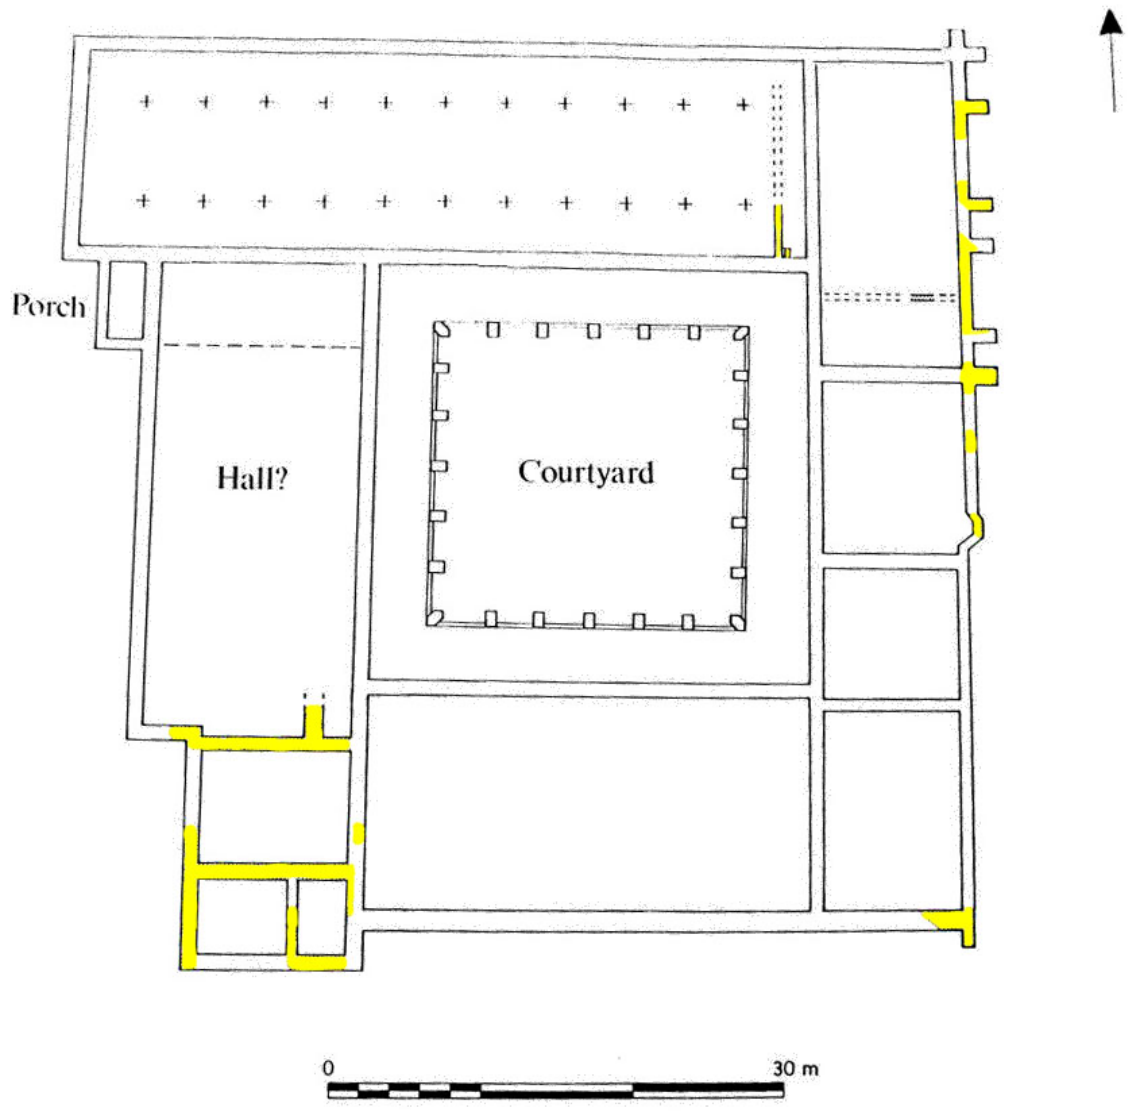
Proposed plan of Audley Inn (Harris, 1987, 87), with excavated wall foundations highlighted in yellow. © English Heritage.
